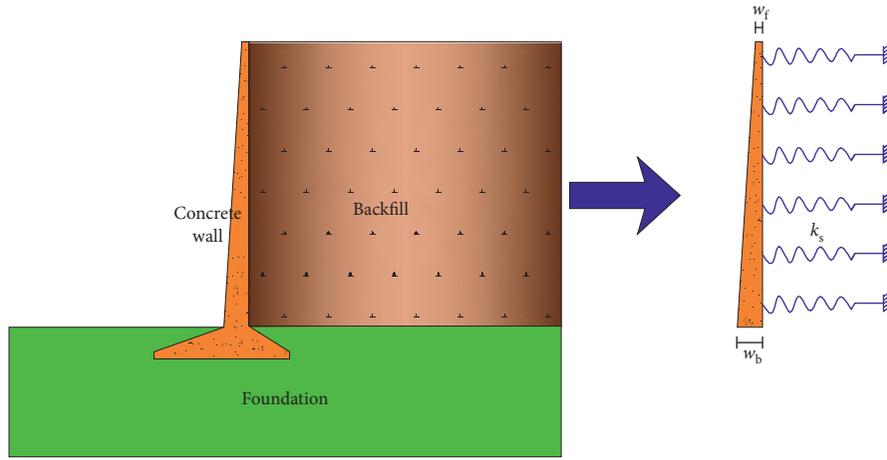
Cross section of a cantilever retaining wall and the mechanical model.
